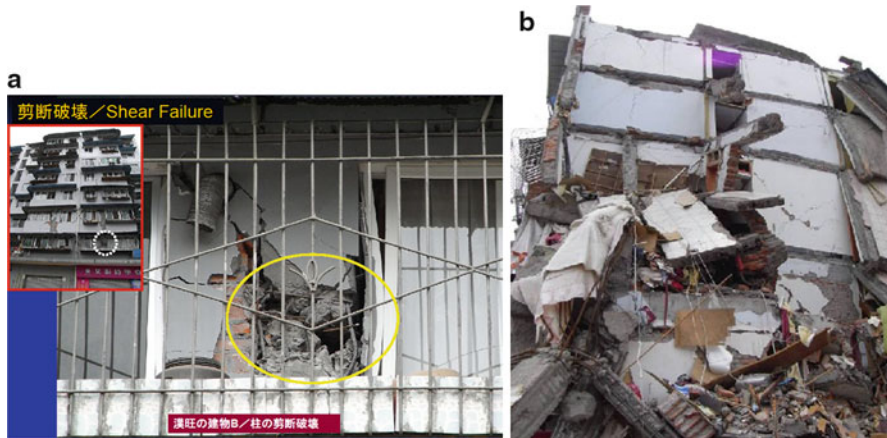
Damage to buildings (2008 Wenchuan earthquake, China). (a) Shear failure of concrete column. (b) Destruction at joint between column and beam
